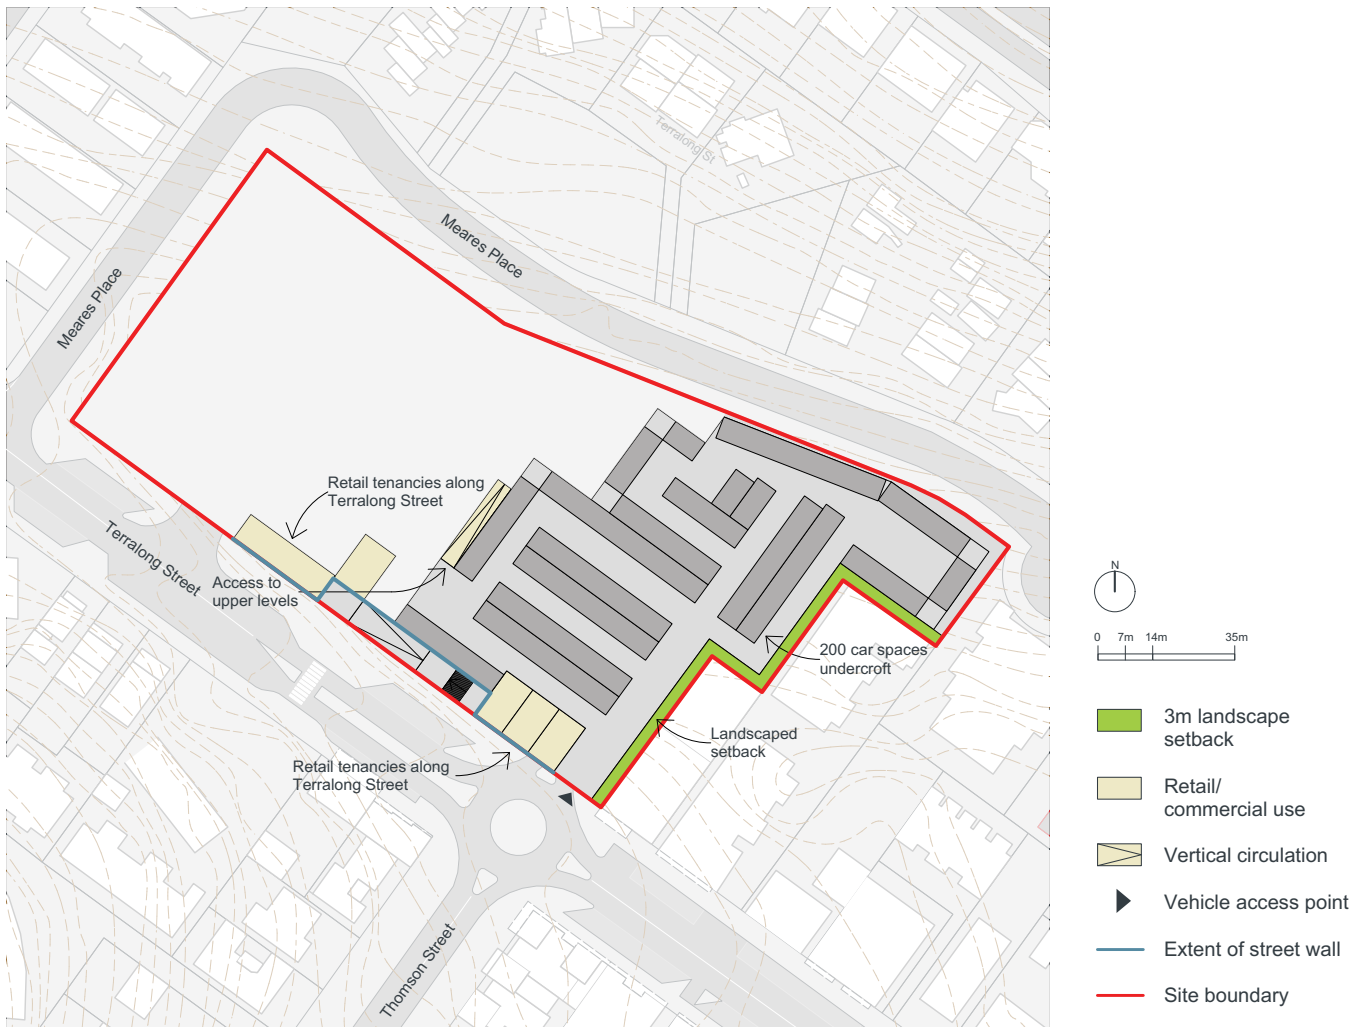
Kiama Village Shopping Centre - Site Layout Plan Undercroft Level
